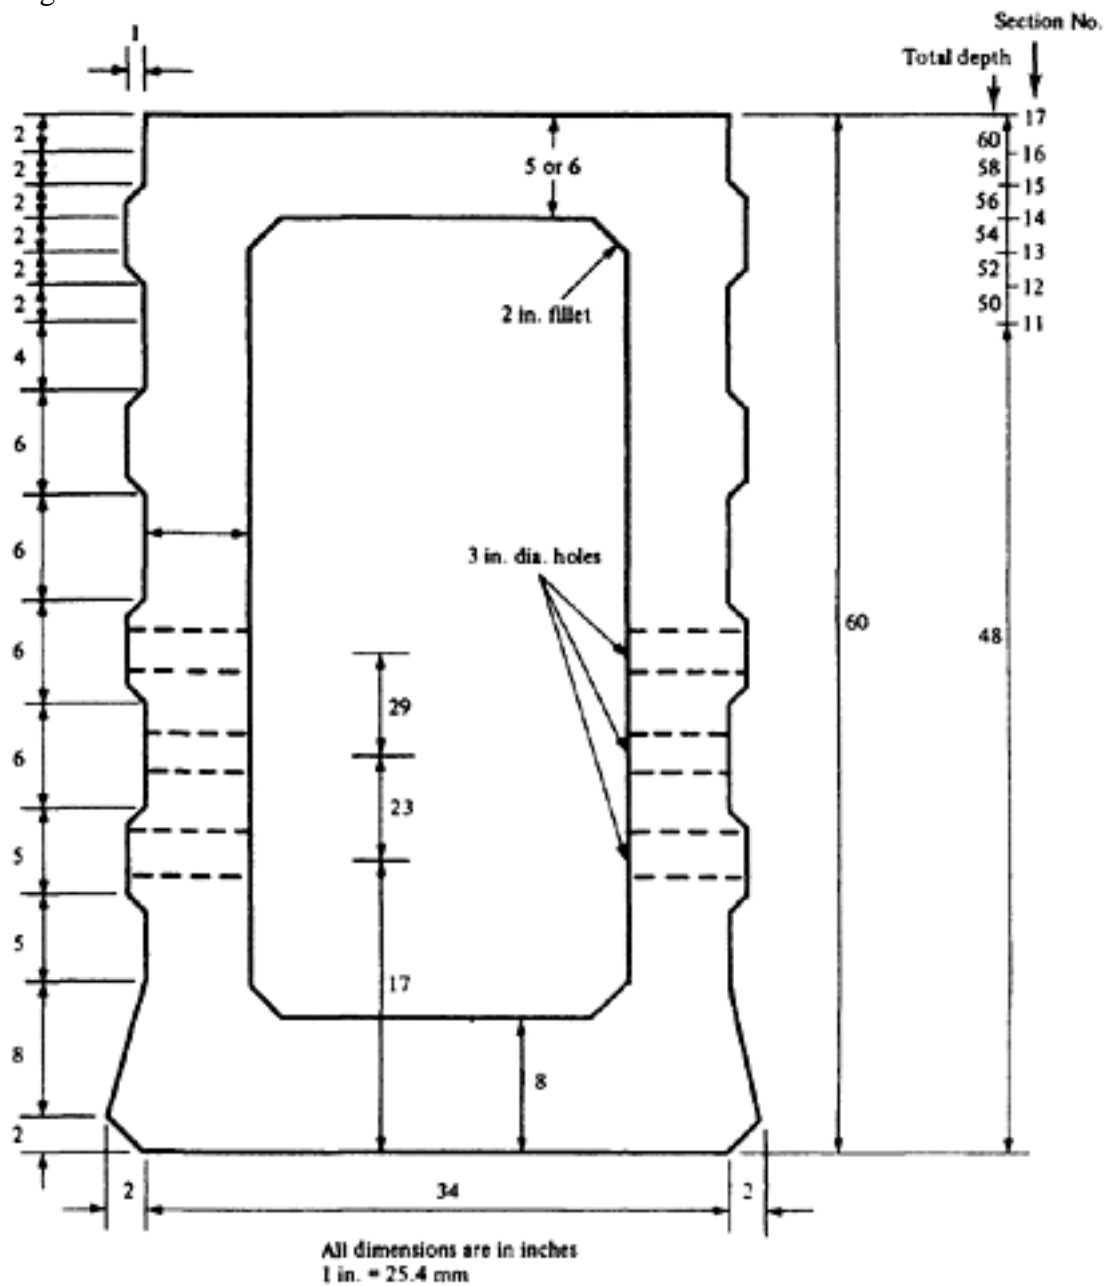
Standard box beams (*The Concrete Society*) to span up to 120 ft 0 in.
